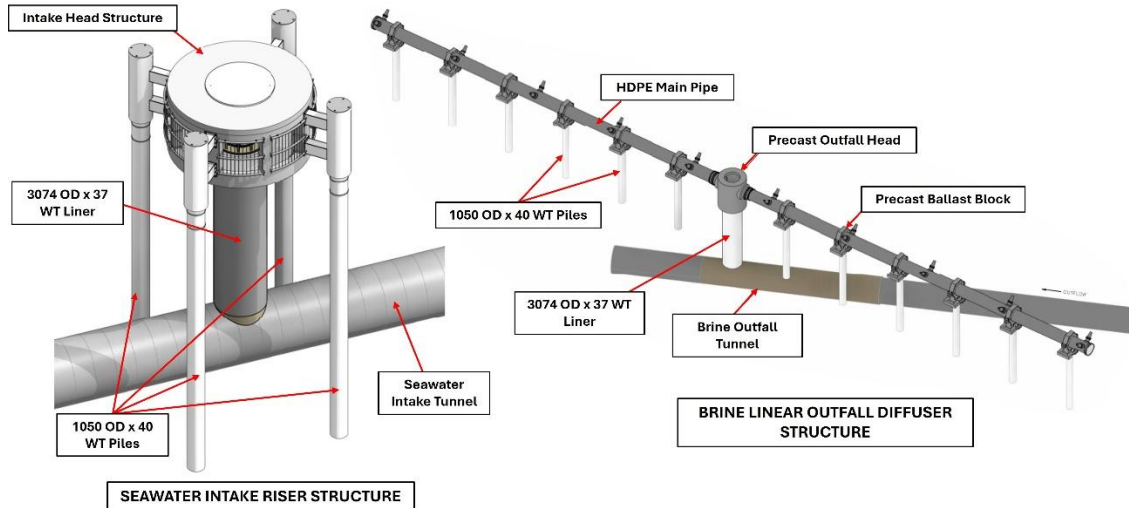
Proposed foundation system for the Seawater Intake Riser (left image) and Brine Linear Outfall Diffuser (right image) structures.
